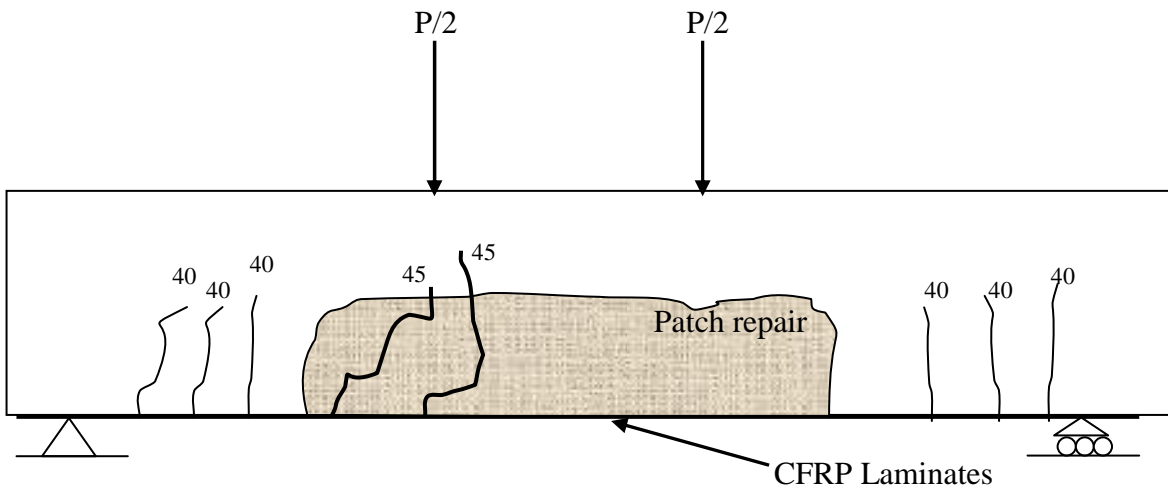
Crack pattern on beams 2 and 4 with patch repair and CFRP strengthening
